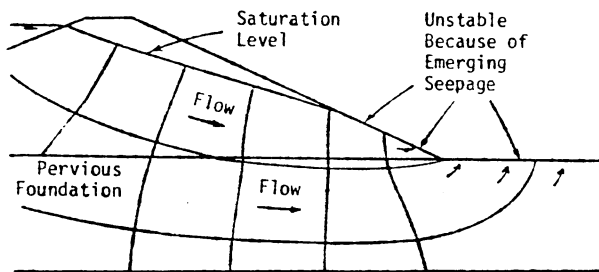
Cross section through a typical dam or levee having no drainage system.
